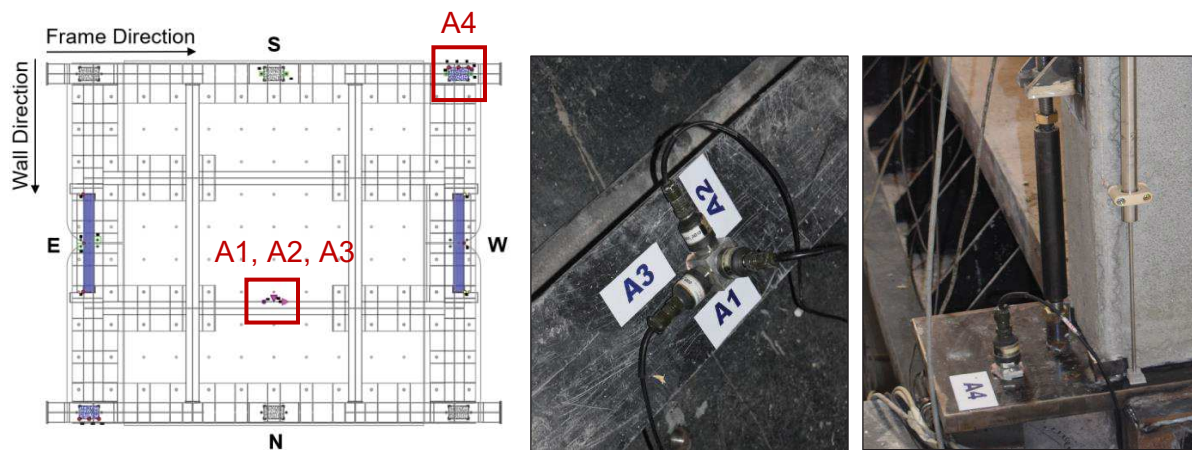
Accelerometers on the foundation level: accelerometers on the steel foundation (centre) and accelerometer on the column foundation plate (right).
